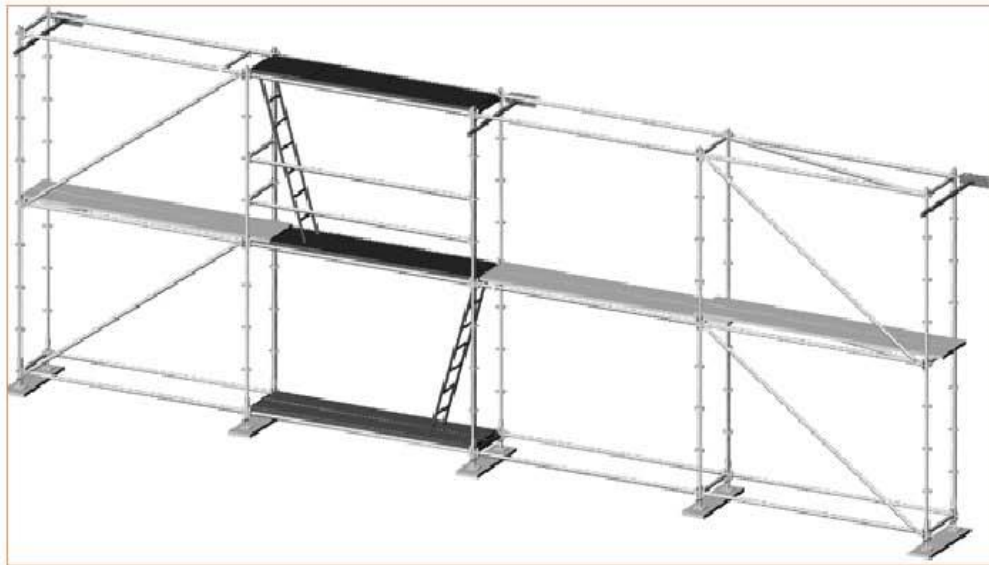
Example of anchoring the scaffolding to the facade
